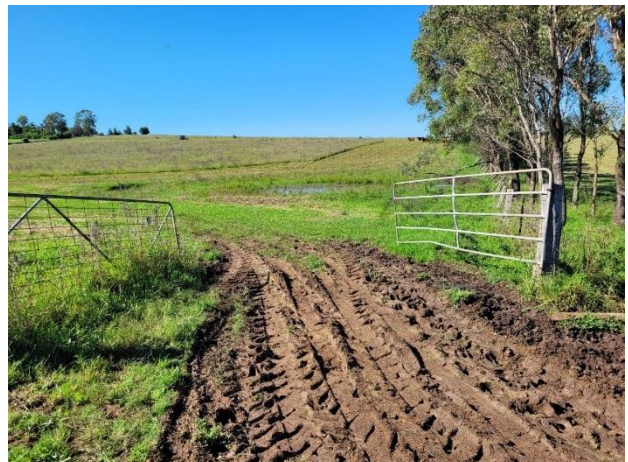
From northern portion of site (proposed Stage 8) facing south.
